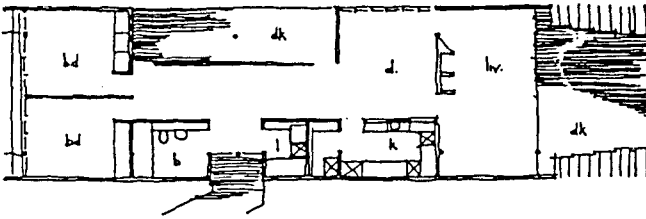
The plan of the Ball-Eastaway house at Glenorie, designed by Glenn Murcutt.
